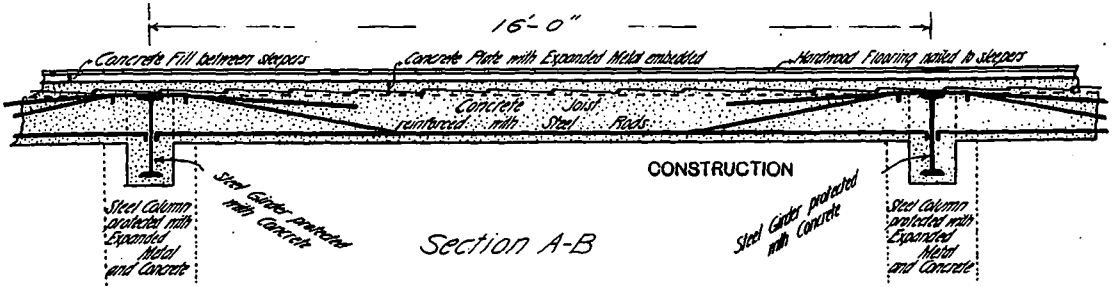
SECTIONAL DIAGRAM OF TYPICAL JOIST BEAM, OGILVIE BUILDING, TORONTO, SHOWING ARRANGEMENT OF REINFORCING RODS AND EXPANDED METAL LATH, ALSO CROSS SECTION OF TYPICAL GIRDERS PROTECTED WITH CONCRETE OVER EXPANDED METAL LATH. THIS SECTION IS DESIGNATED AS A-B IN FIG. 16.
